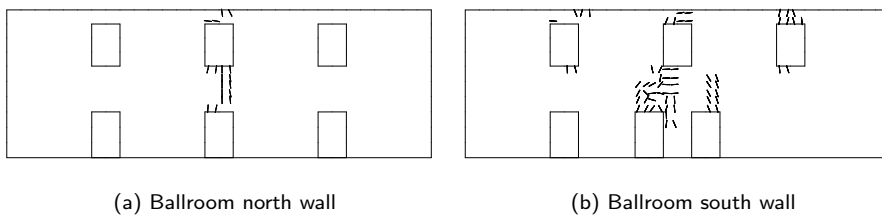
Model crack pattern, 50% of the tunnel excavation, $V_L = 1.5\%$, upper floors.
